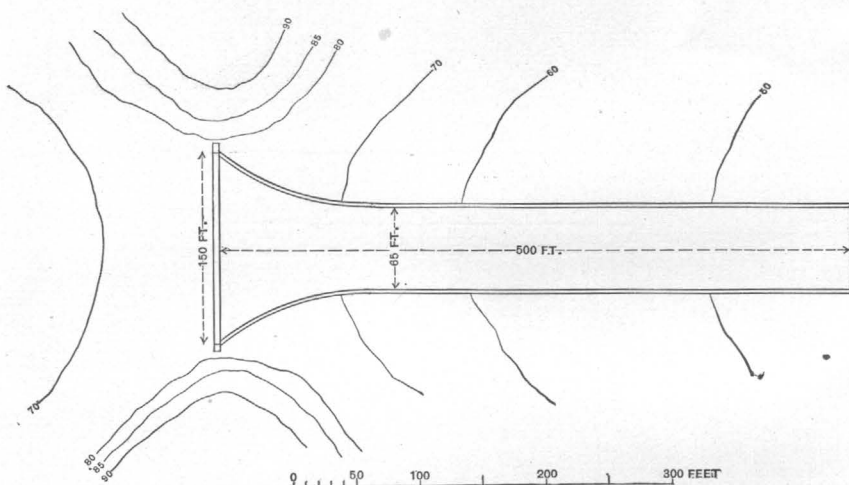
Plan of wasteway, rock-filled dam, East Park dam site.
